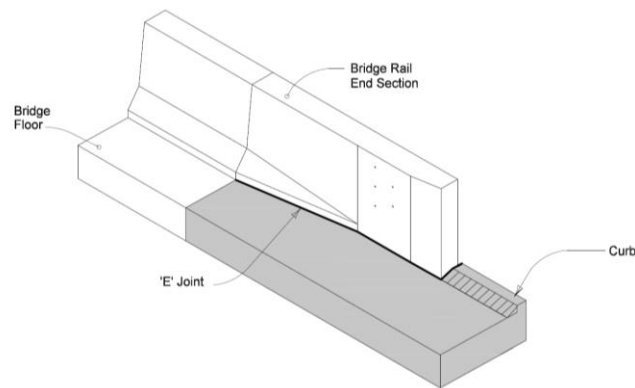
Iowa DOT Curb E Joint Detail (Iowa DOT).
